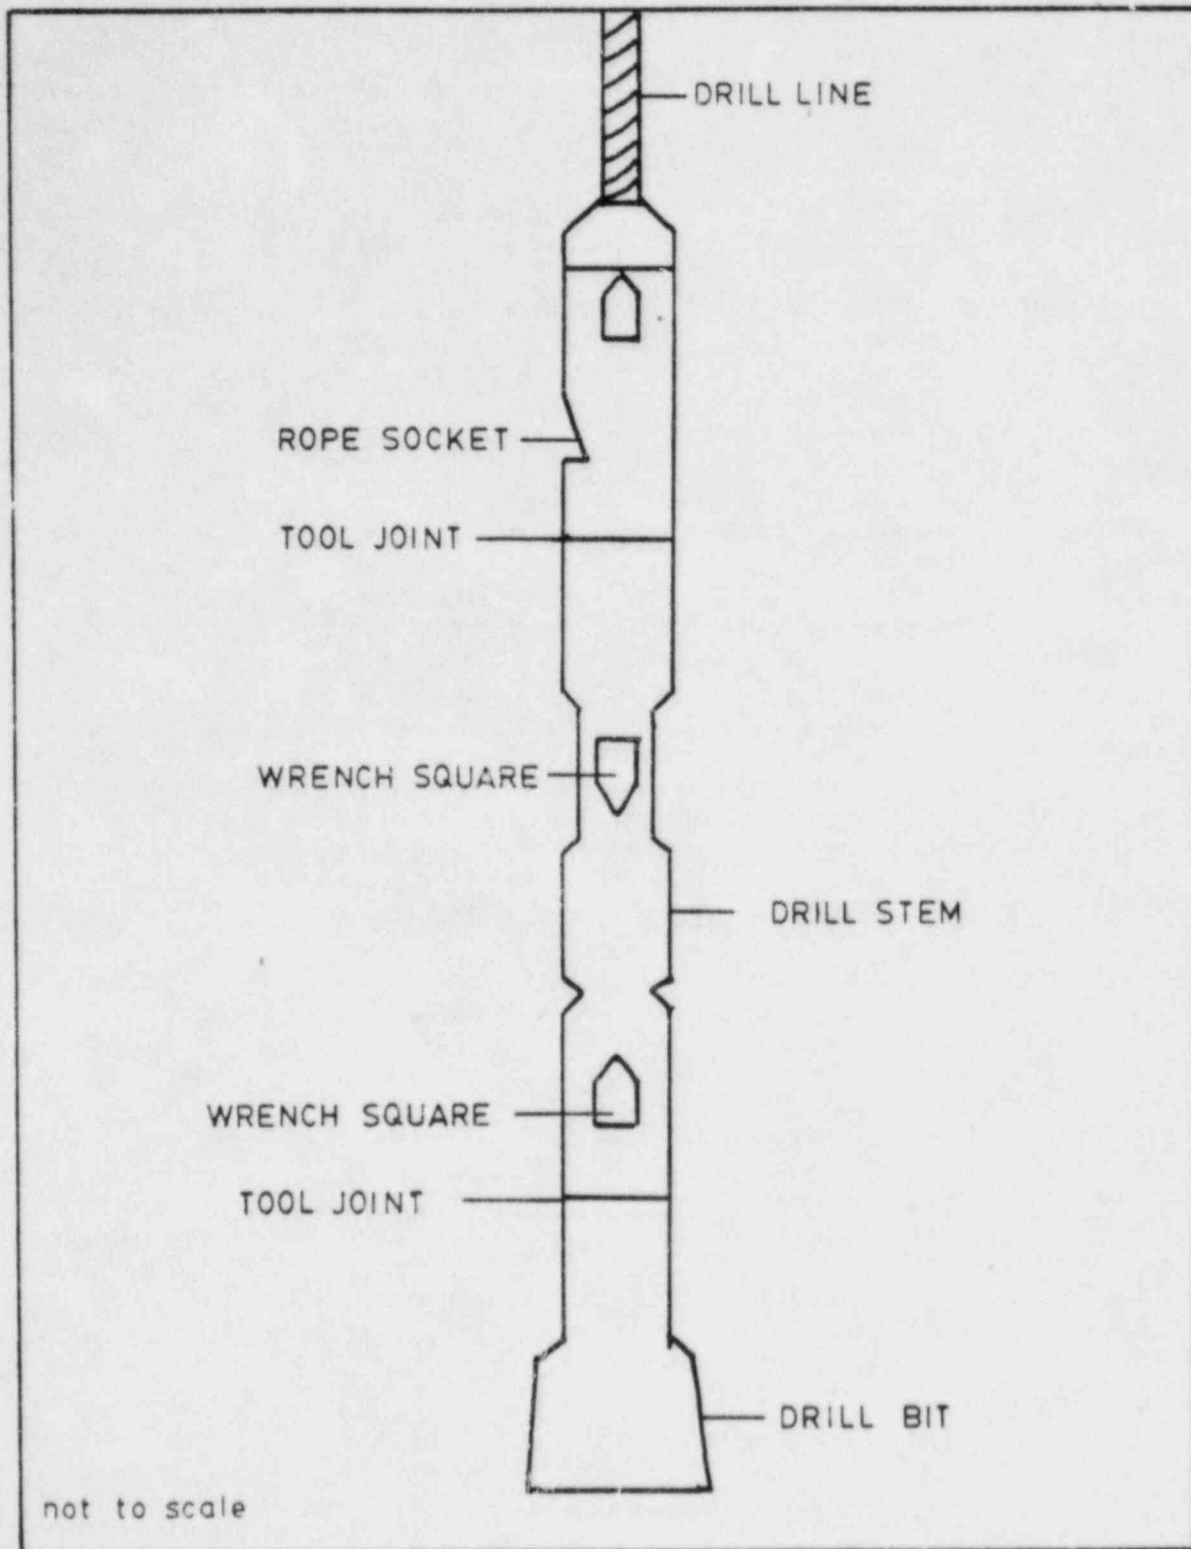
Hole 83-4E: diagram of tools used for drilling.
